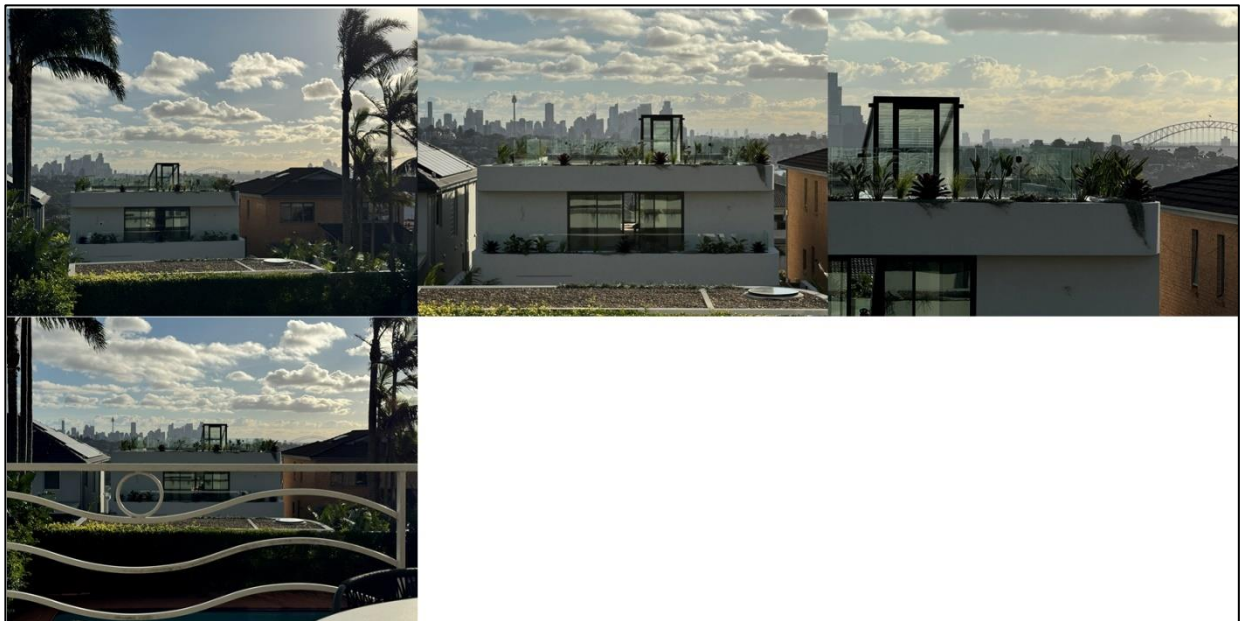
Views from 9 Wallangra Road, looking west towards the city and harbour bridge, currently obstructed by the unauthorised roof access hood.
